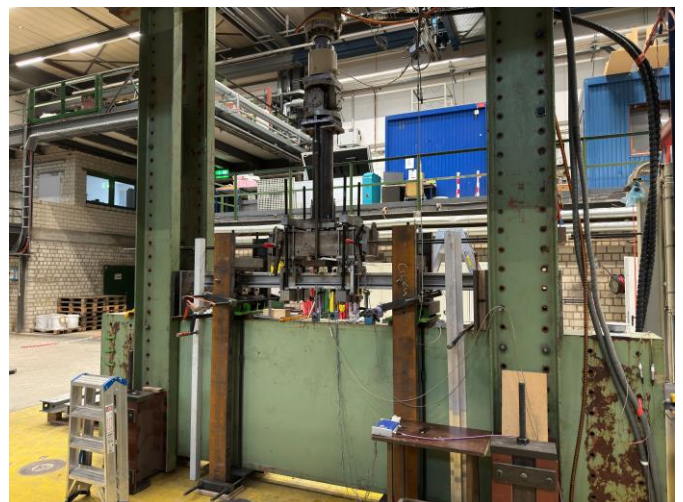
Four-point bending test used to evaluate notch details on modular expansion joints. Source: Author
